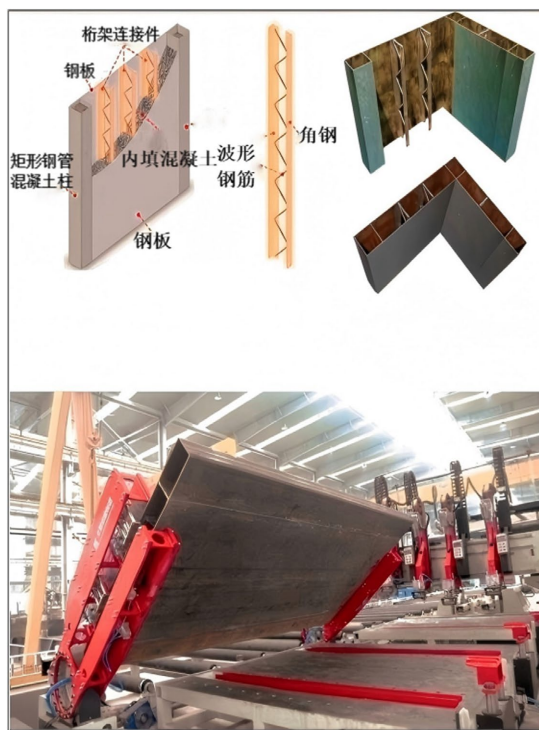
Structure and production line of truss stiffened multi-cavity steel plate composite shear wall
